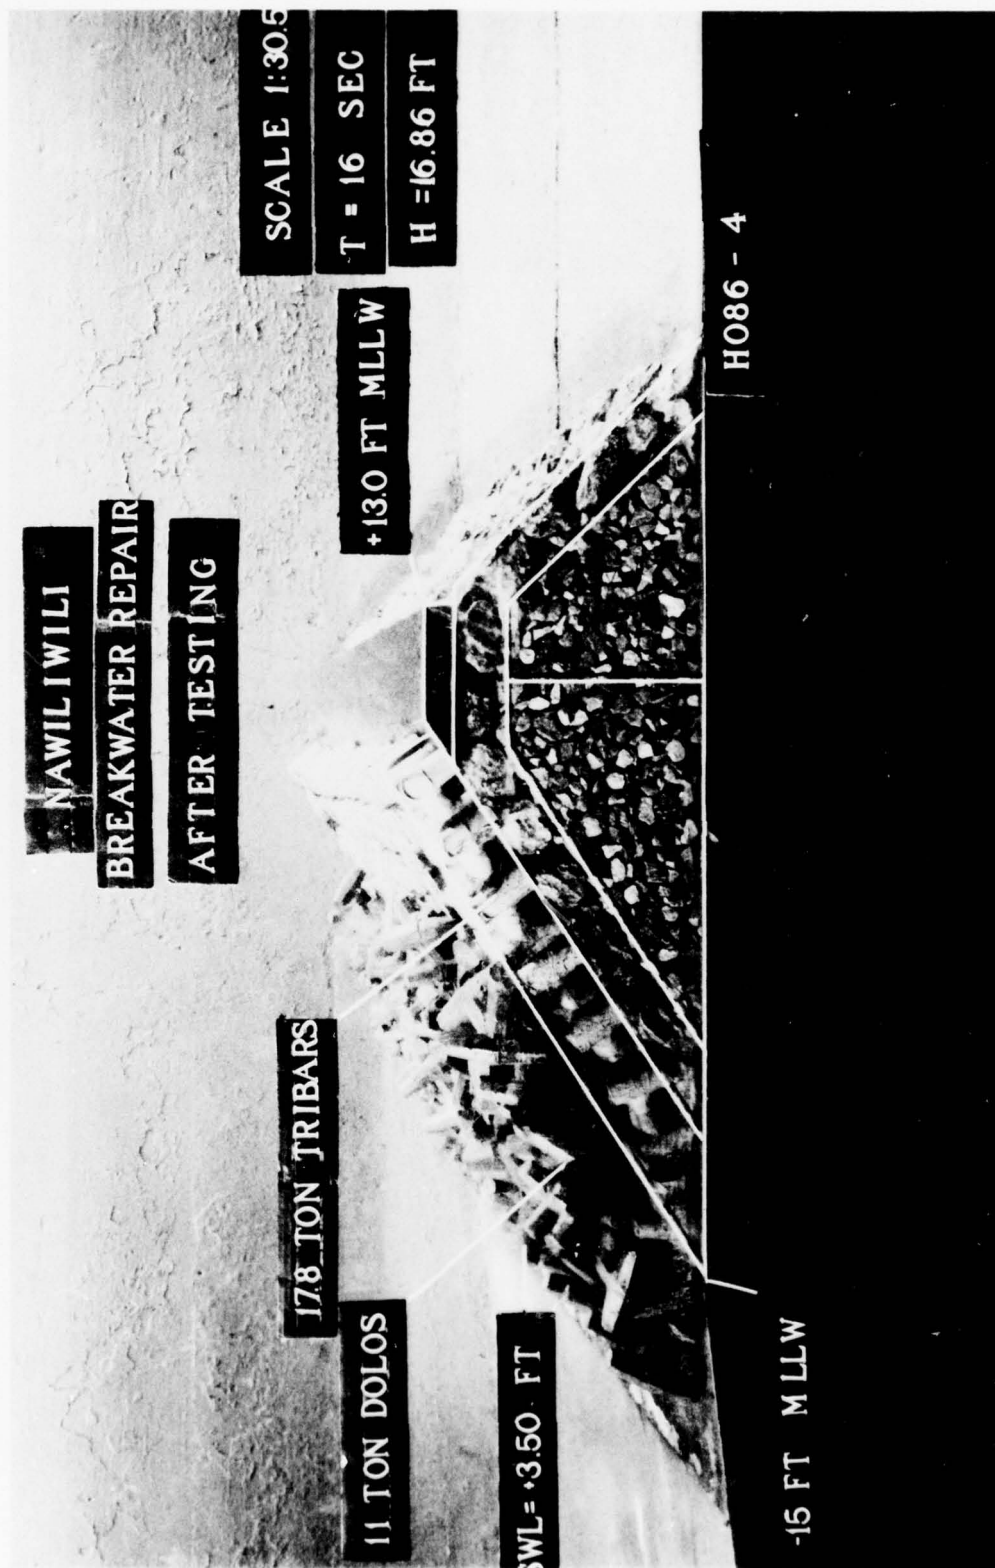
Side view of test section 1 after testing with 16-sec, 16.9-ft wave at +3.5 ft mllw swl
